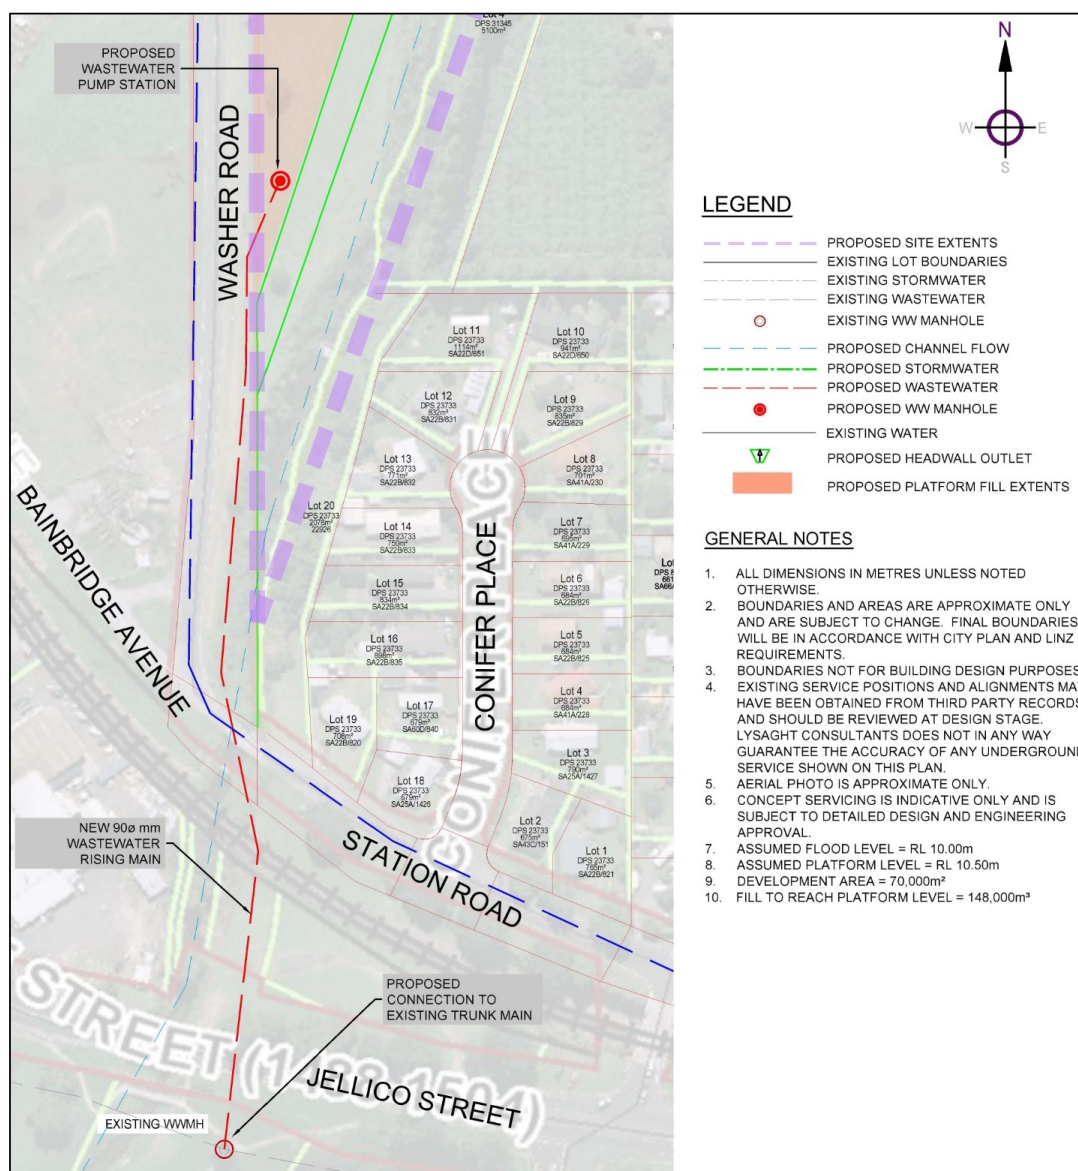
Lysaght Servicing Plan showing wastewater infrastructure
